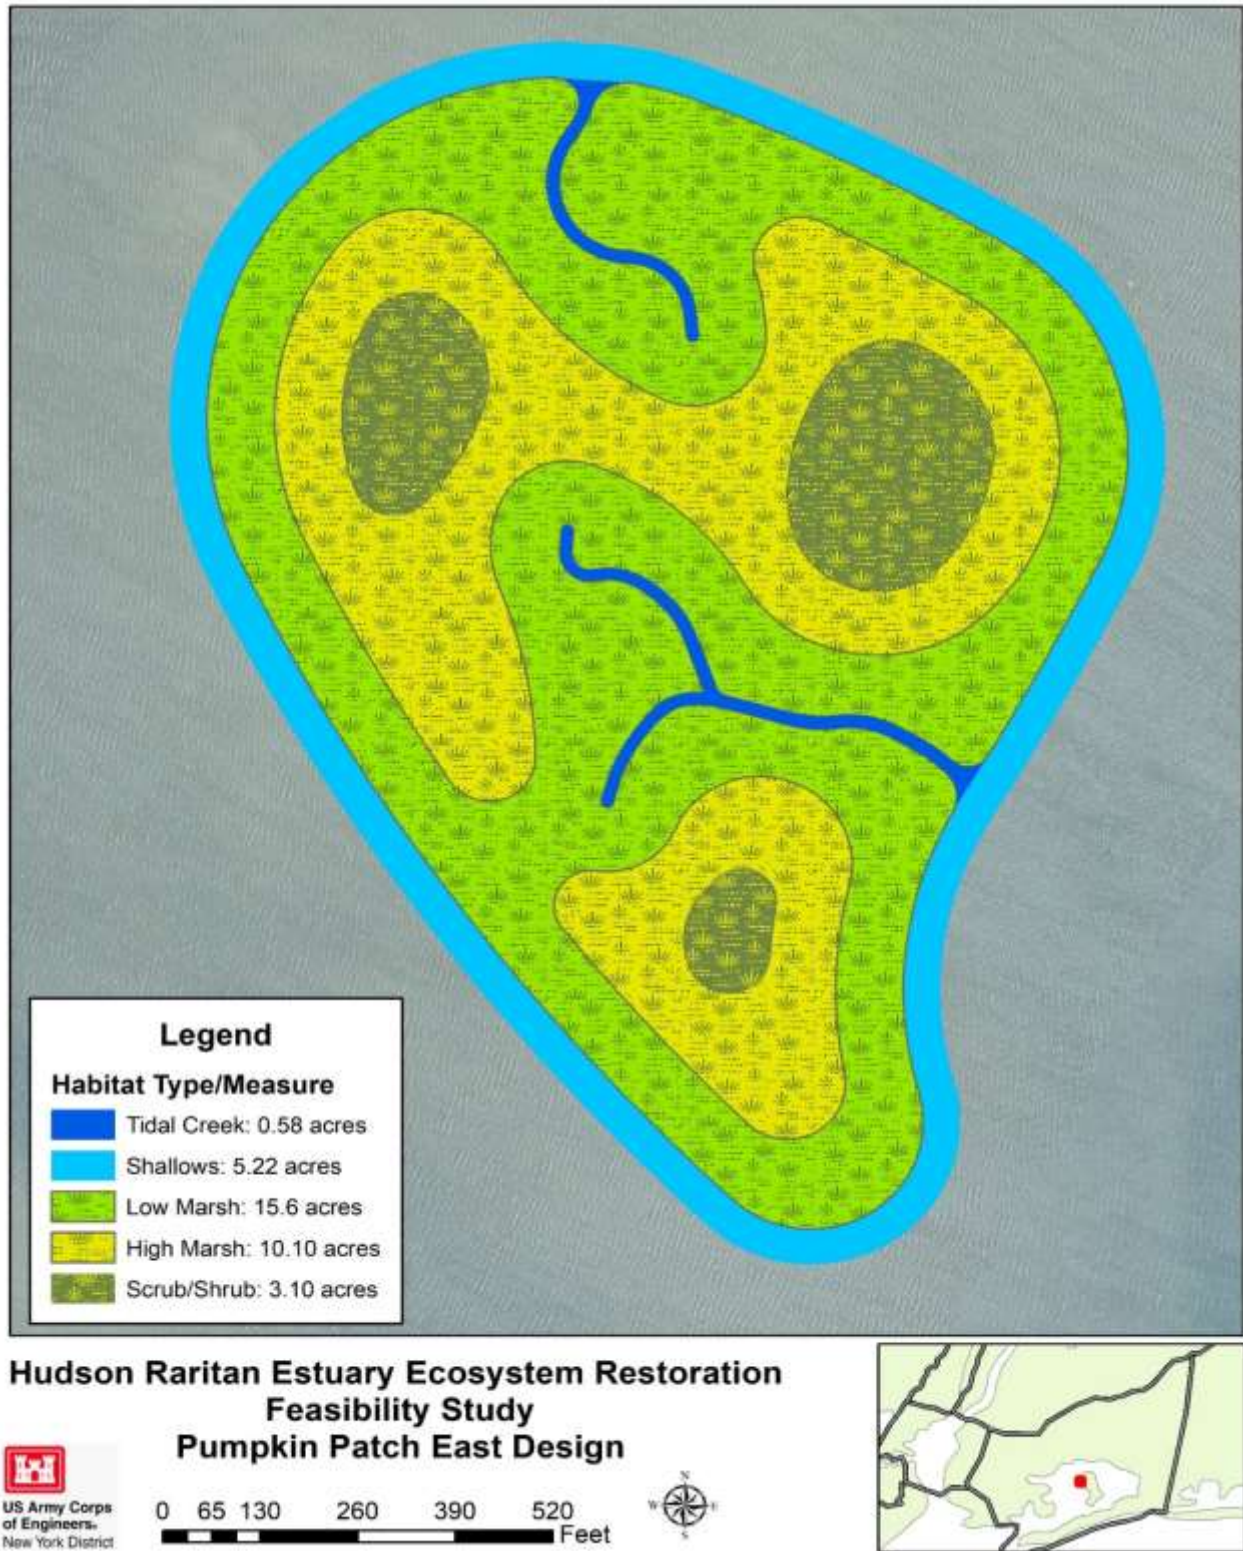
10. Pumpkin Patch East - Recommended Plan Design
